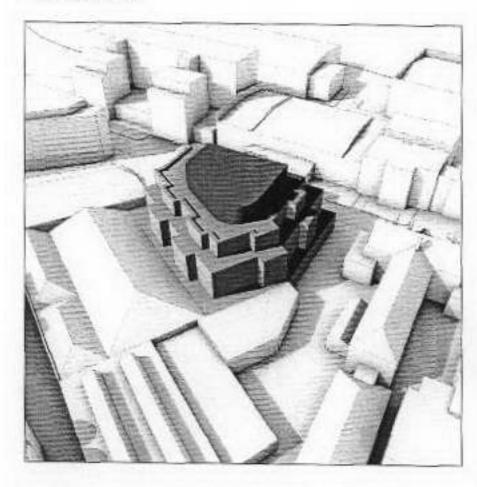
Computer model of 55 Holmes Road showing the existing disused plant room in red.
